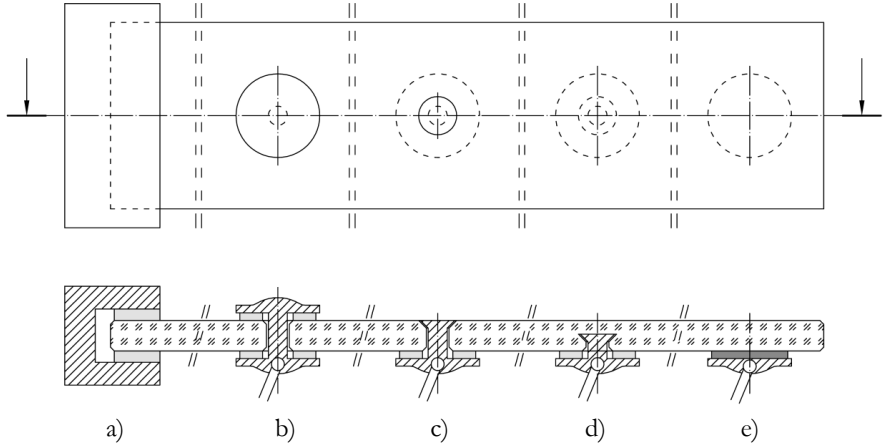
SCHEMATIC REPRESENTATION (CROSS-SECTION) OF THREE DIFFERENT WAYS TO CONNECT GLASS PANELS TO THE UNDERLYING STRUCTURE WITH (A) LINEAR ADHESIVE SUPPORT, (B), RAISED HEAD BOLTED POINT-FIXING, (C) COUNTERSINK BOLTED POINT-FIXING, (D) UNDERCUT BOLTED POINT-FIXINGS AND (E) ADHESIVE POINT-FIXING.
